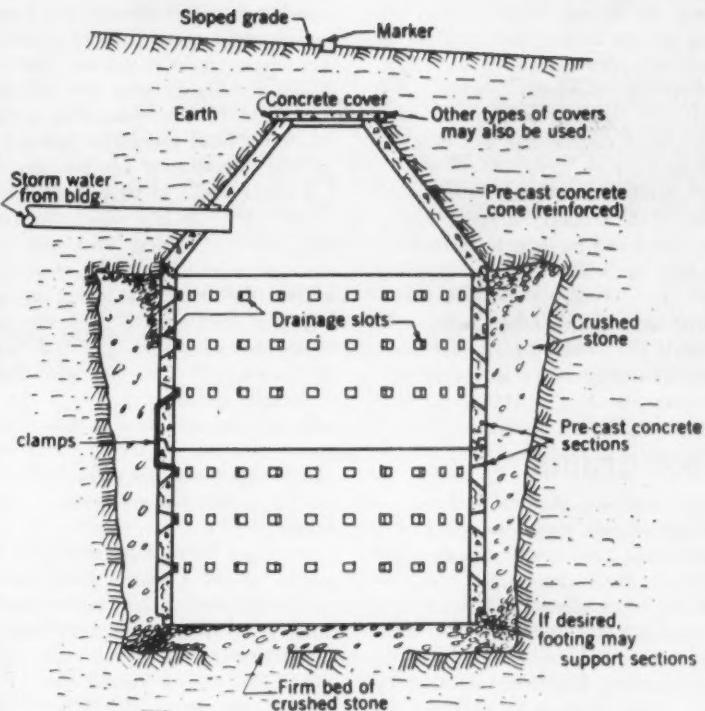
Installation details of a dry well constructed of precast concrete sections
